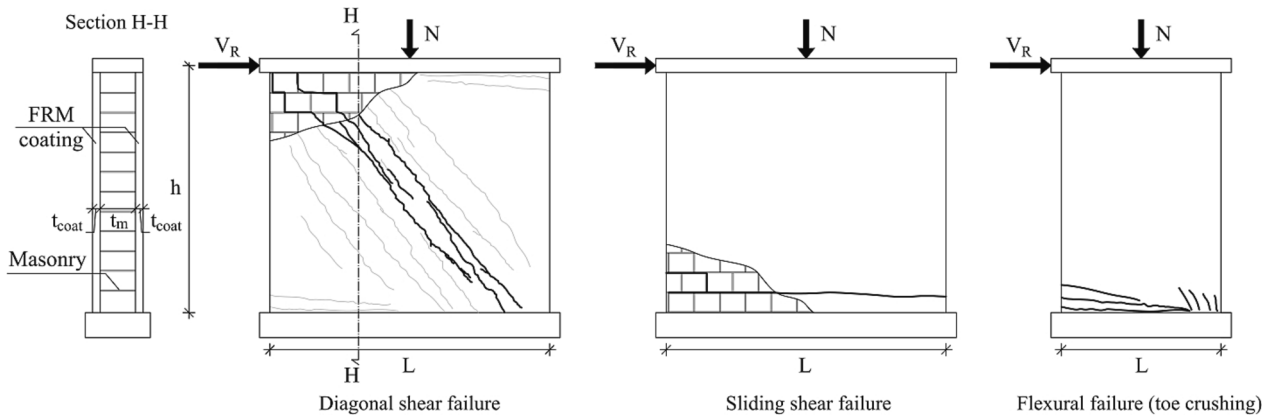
Typical failure modes of strengthened masonry.
